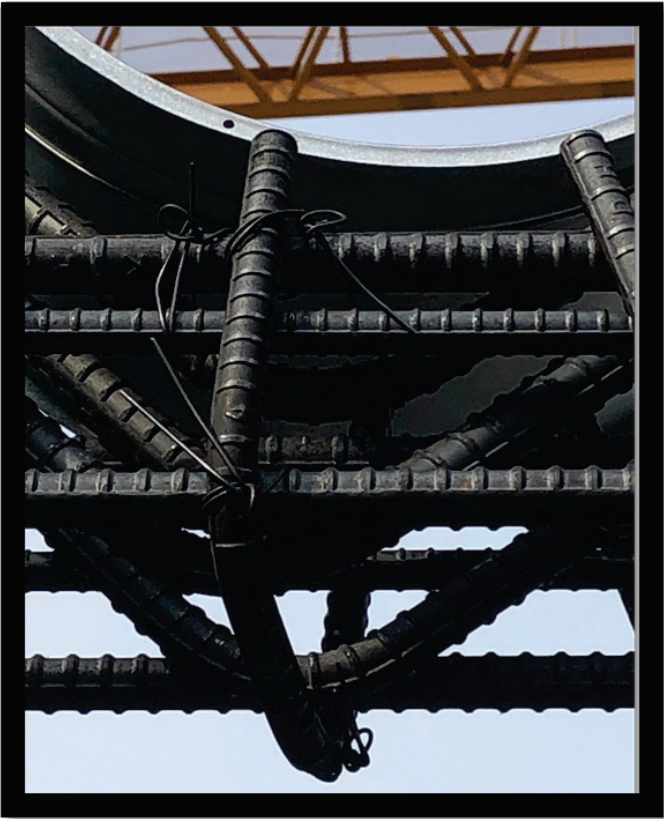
Rebar congestion in slab-beam intersection in Parking Garage 4.
